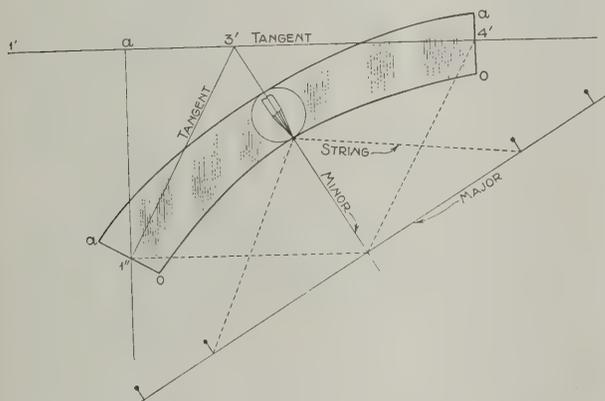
Showing How to Draw the Face Mold Upon the Plank
